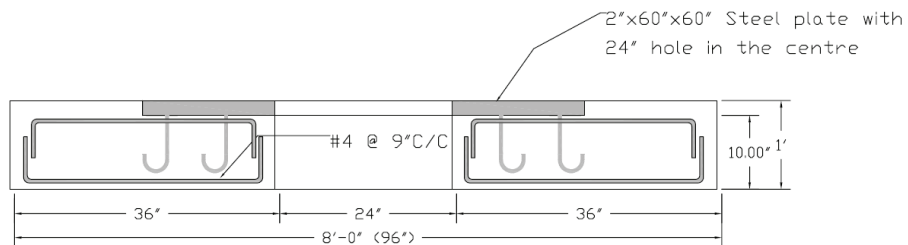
Geometric Section of the Reinforced Concrete Slab (Muhammad, 2012)
